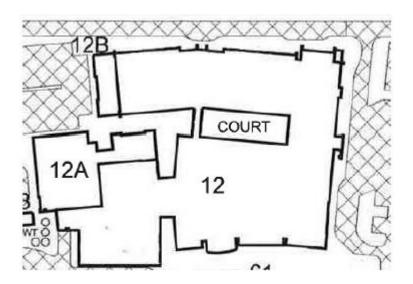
Key Plan of Spinal Rehab Existing Buildings
